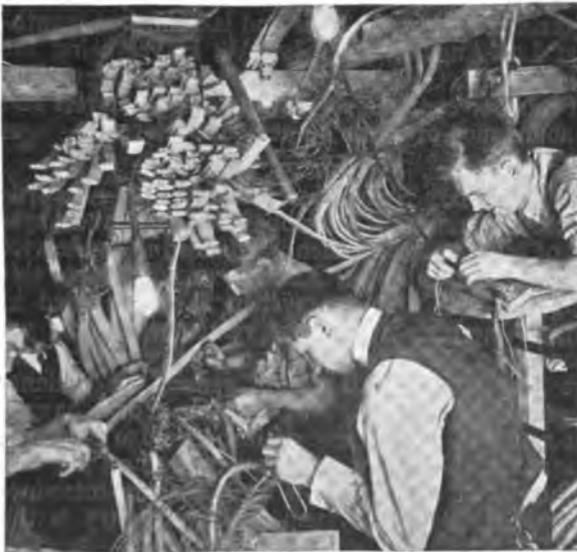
SPLICERS AT WORK ON SIX HUNDRED CABLES, EACH SPLICE INVOLVING HANDLING OF 192 WIRES, WORCESTER, MASS.
